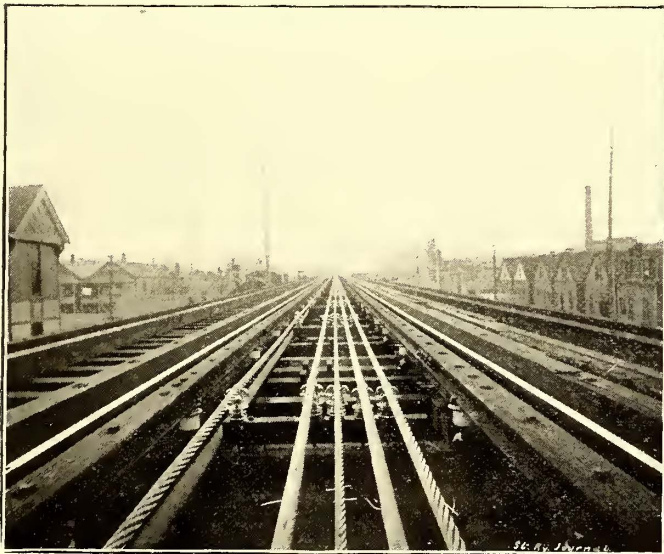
VIEW OF TRACK, SHOWING CABLES
